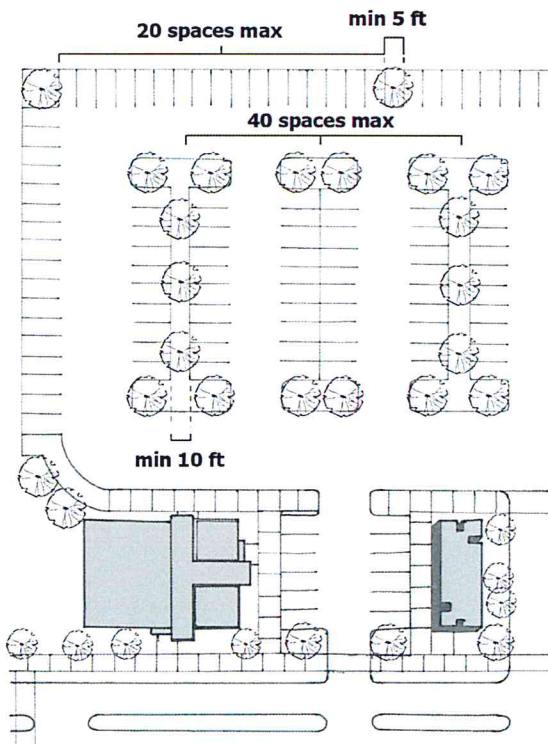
(Landscaping & Shared Parking): Shared lots should maintain a single access point, and ensure blocks of parking (40 spaces) are broken up with the use of medians, either landscaped and/or with pedestrian connections. Additionally, parking lots shall provide a landscaped island for every 20 spaces and one shade tree per 10 spaces. These design elements may be placed as desired, as shown in the 140+ space example above.
